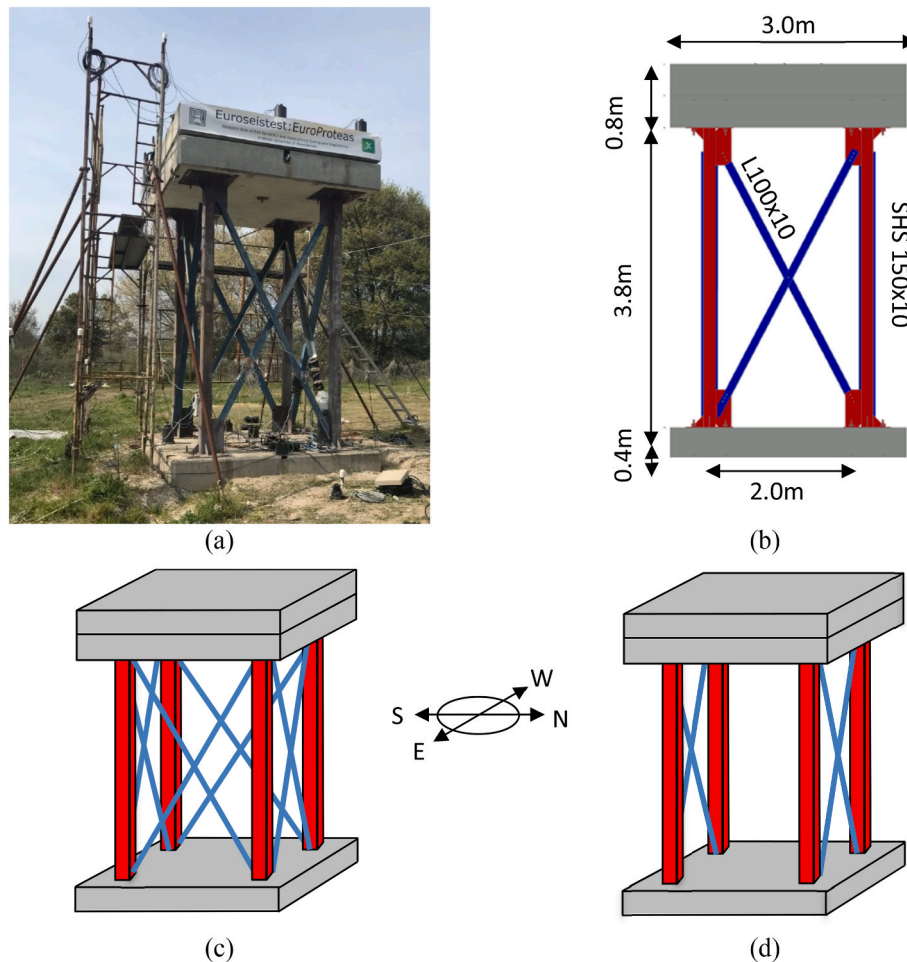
EUROPROTEAS'S (a) picture, (b) structural elements, (c) fully braced 2-top slab configuration (FBr) and (c) partly braced 2-top slab configuration loaded along its weak plane (PBr).
